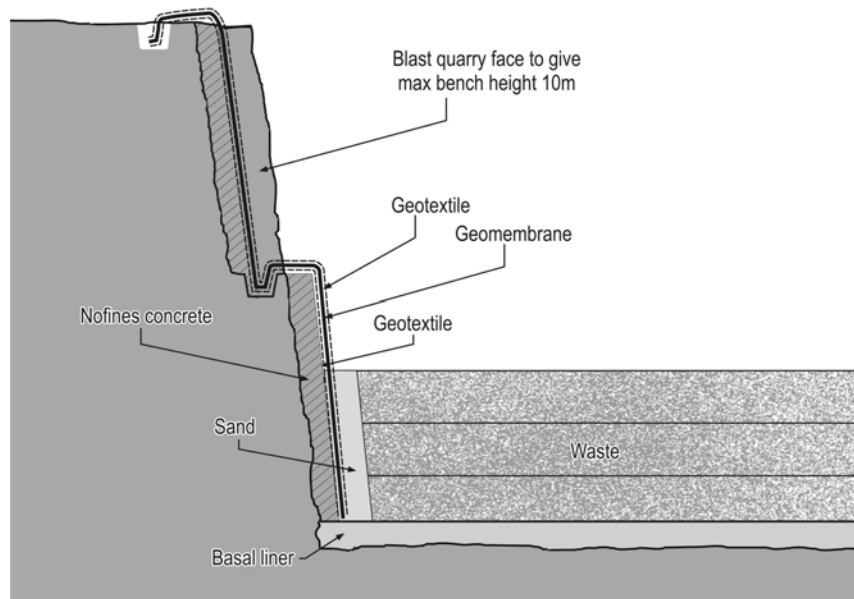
Example of a no-fines concrete supported geomembrane system
